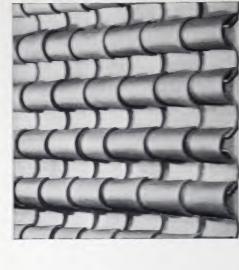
# DETAILS OF IMPERIAL SMALL TAPERED MISSION TILES AND FITTINGS
